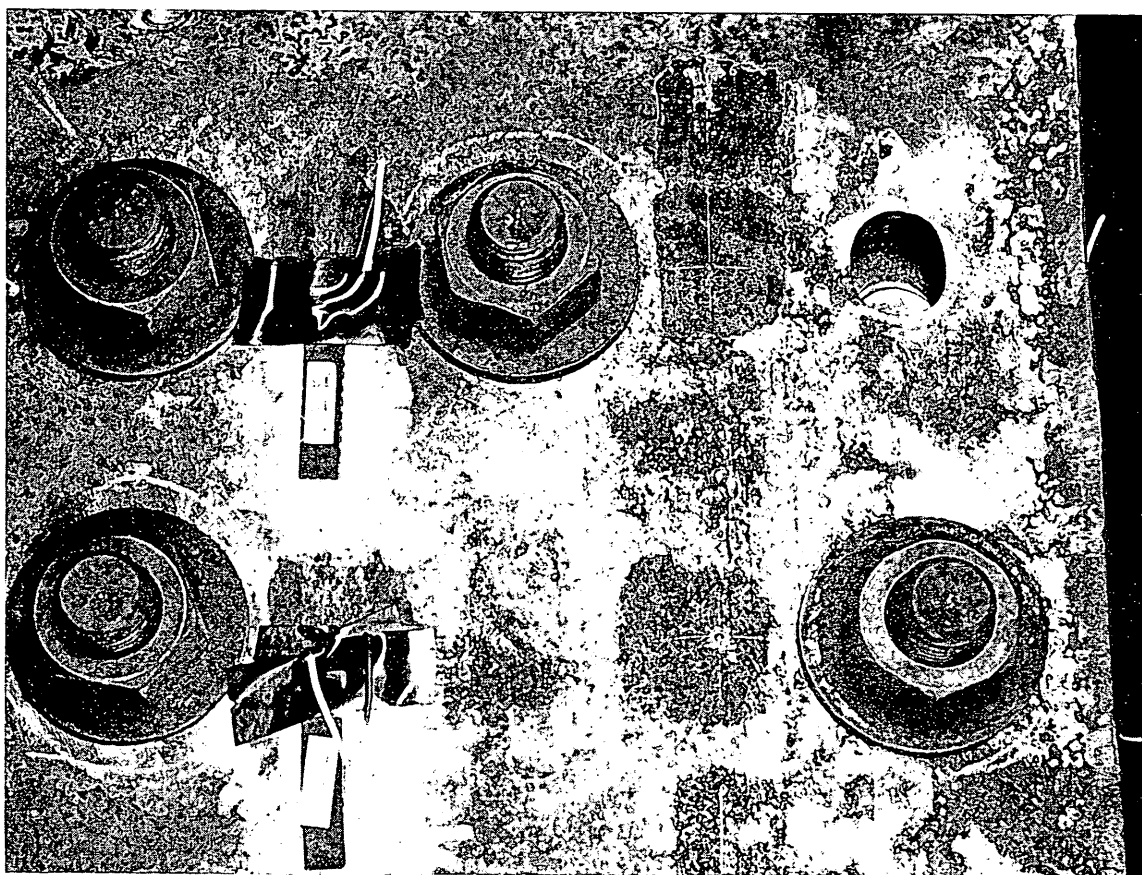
JOINT B5 FAILURE SHOWING SHEARED BOLT SHANK
